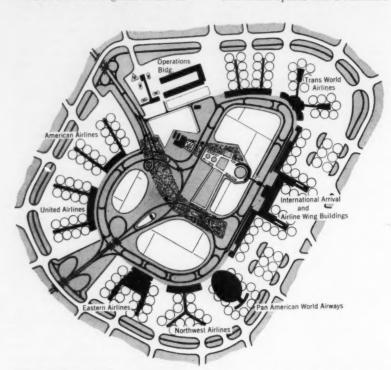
Final plan (1955) for "Terminal City" at New York International Airport indicates final sites and designs for unit terminals.
